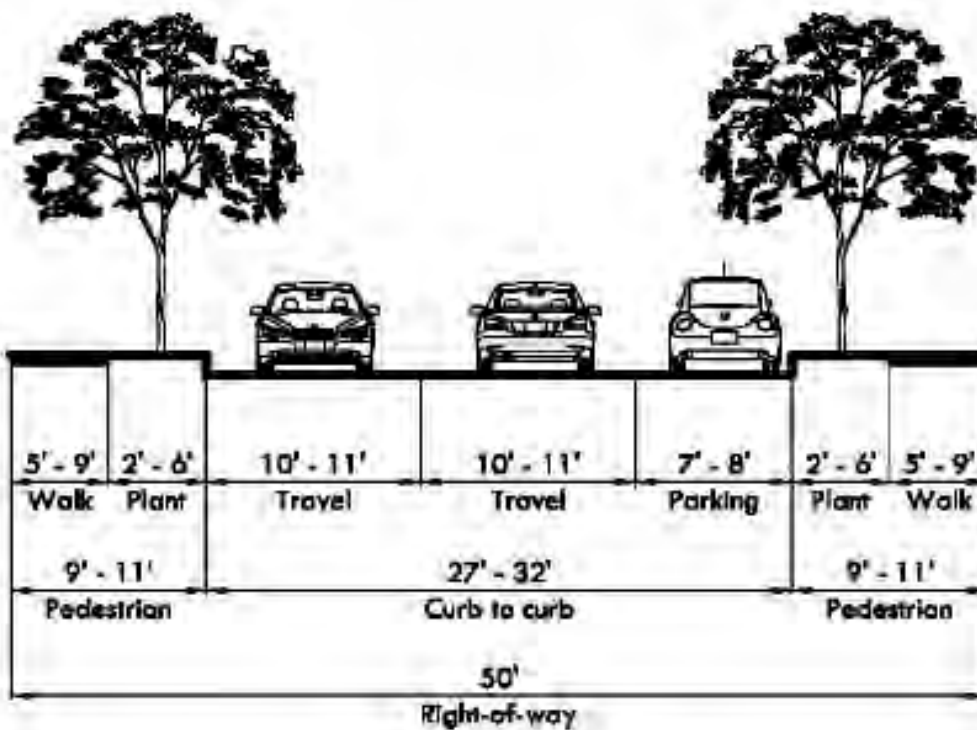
Typical “C” Street with 50’ Right-of-Way Section
